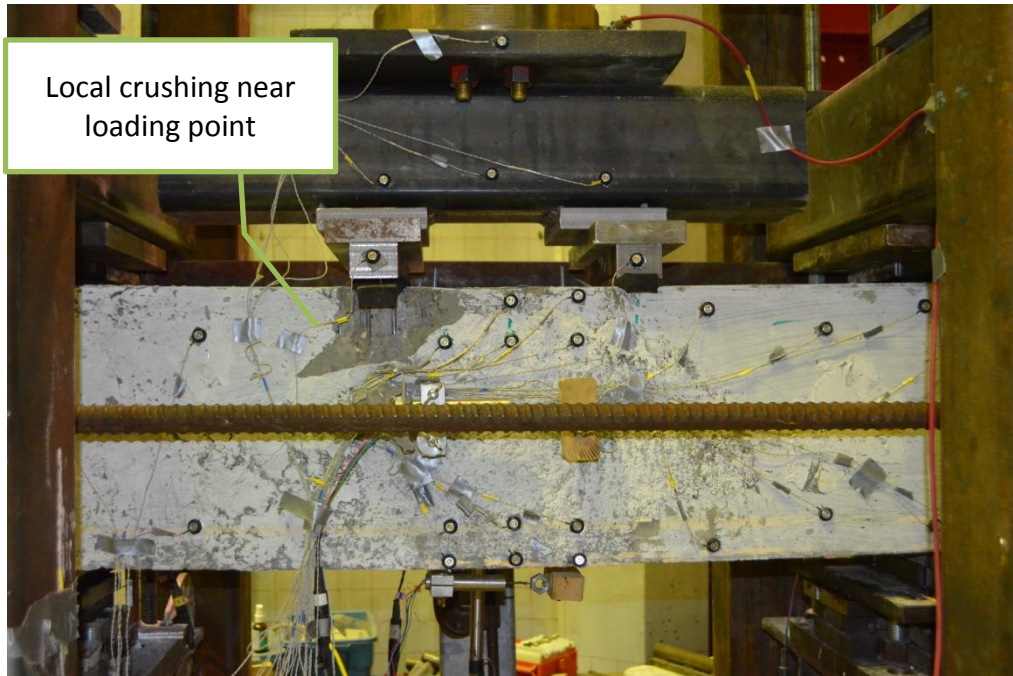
Local Crushing and Spalling of Cover Concrete in Specimen H2S1-M at Displacement Ductility One
